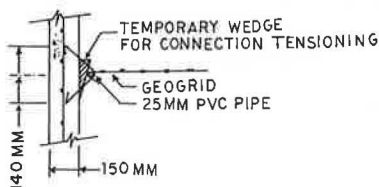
Measurements of strain in connection between geogrids and wall facing.
